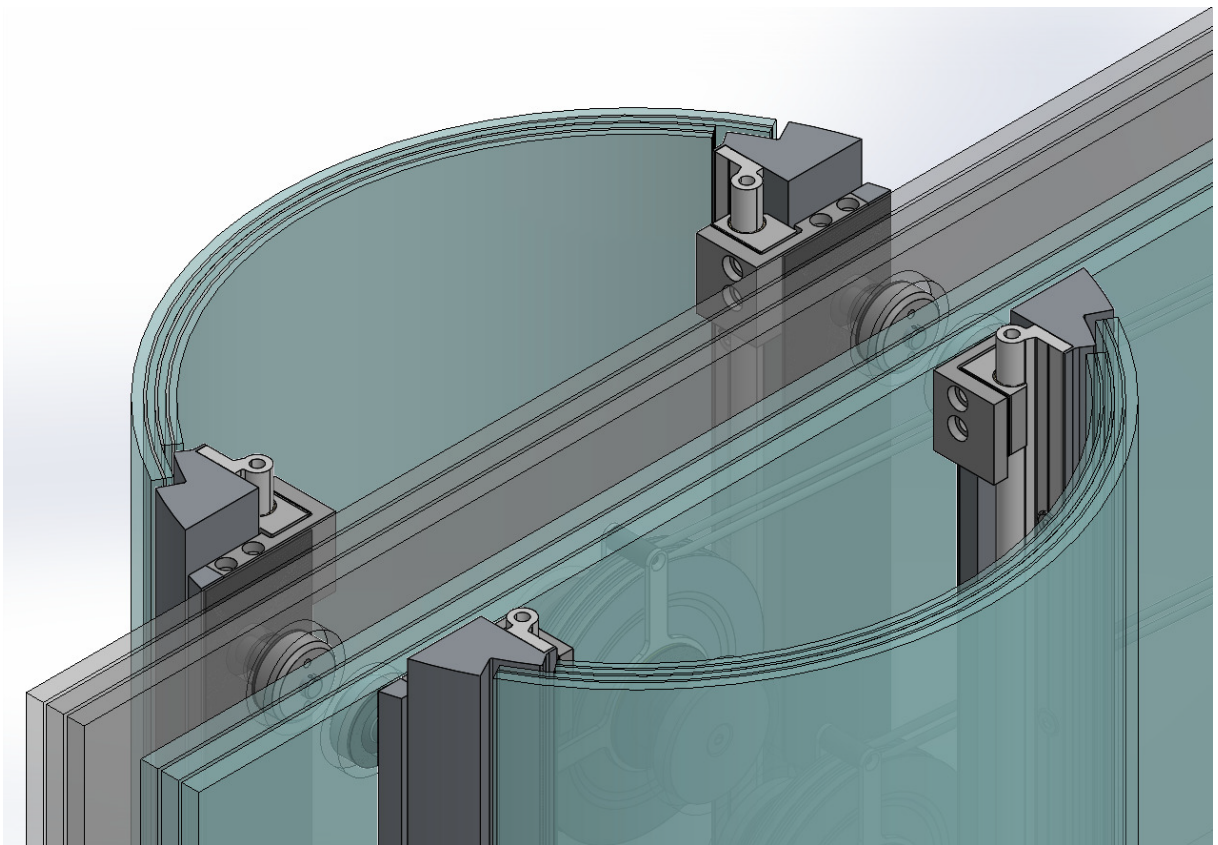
Section cut showing sliding interface details between glass cylinder and glass beam. Image courtesy of TriPyramid.
